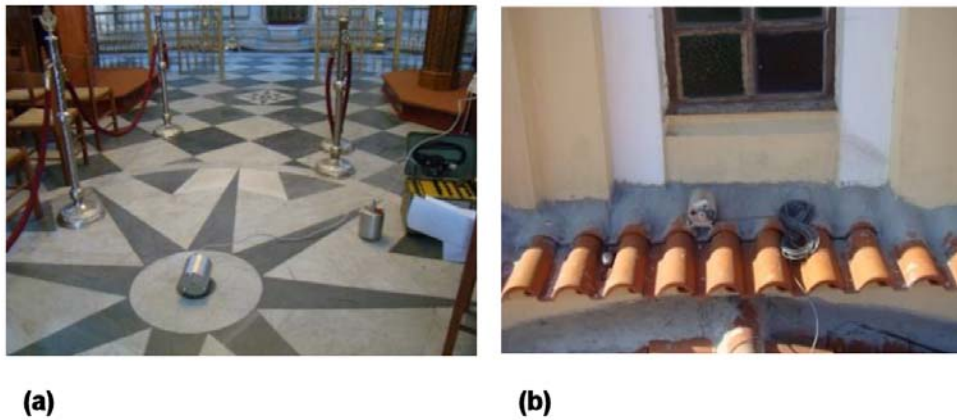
Ambient Vibration testing at indicative positions: (a) ground floor beneath the central dome; (b) roof of the mezzanine.
